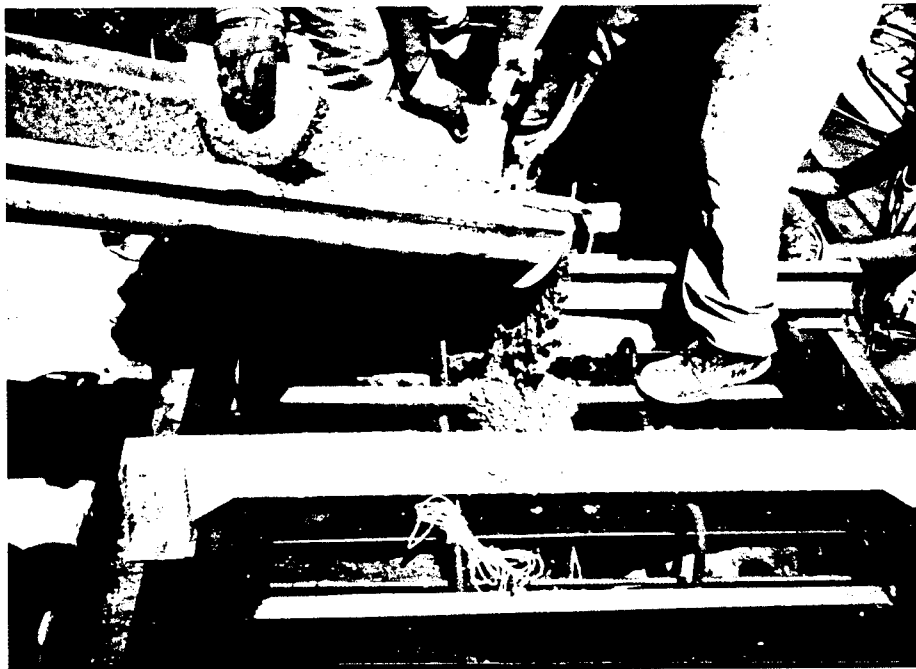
Casting Concrete of the Full Scale Test Girder
